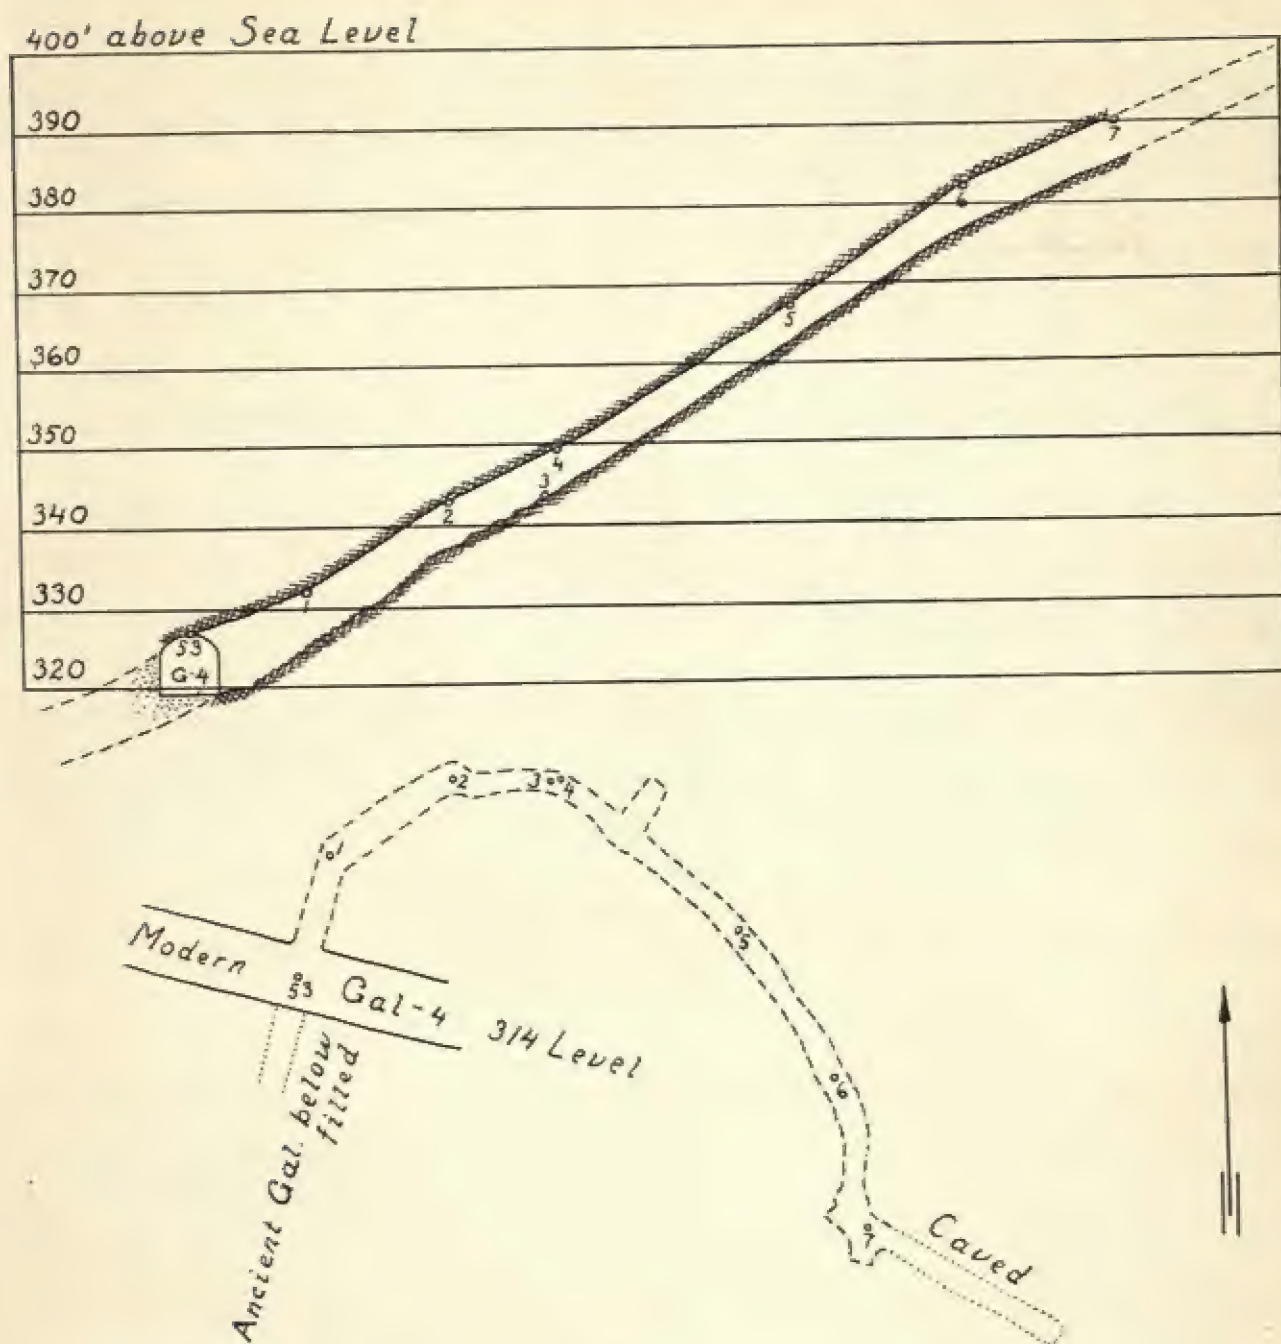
Mavrovouni. Plan and cross section of ancient stairway gallery on 314 ft. level.
